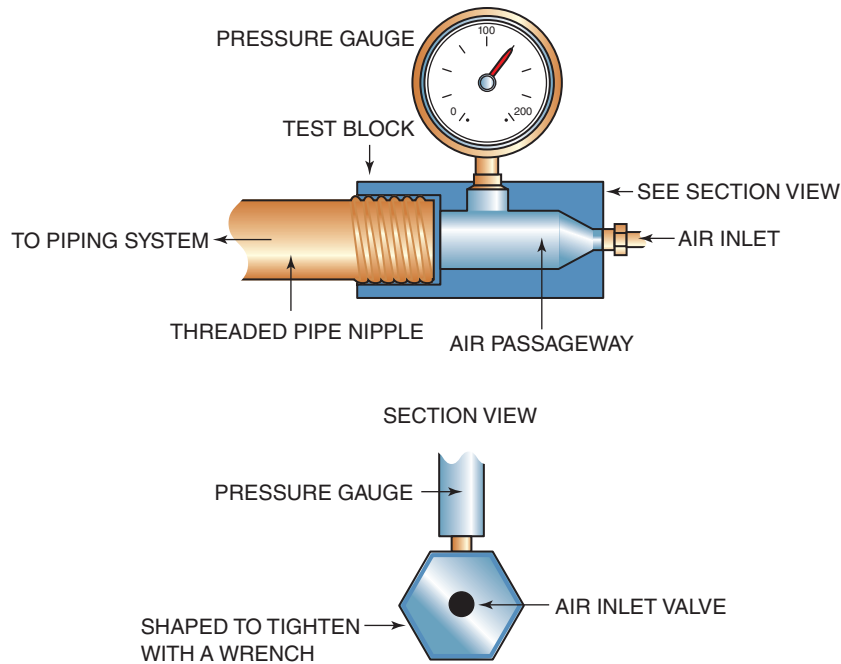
A test block is available to be connected to a piping system when performing an air test.
